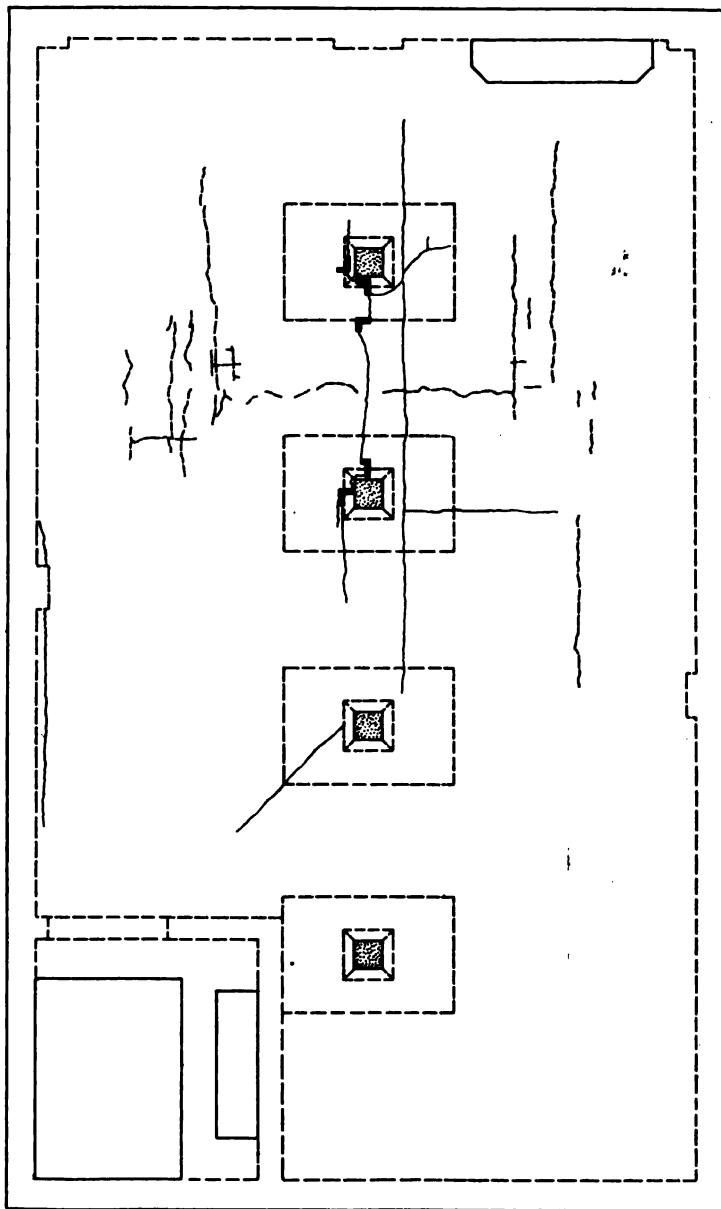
PLAN SHOWING LOCATION OF CRACKS. FULL LINES INDICATE CRACKS ON TOP AND DOTTED LINES ON BOTTOM OF SLAB.
